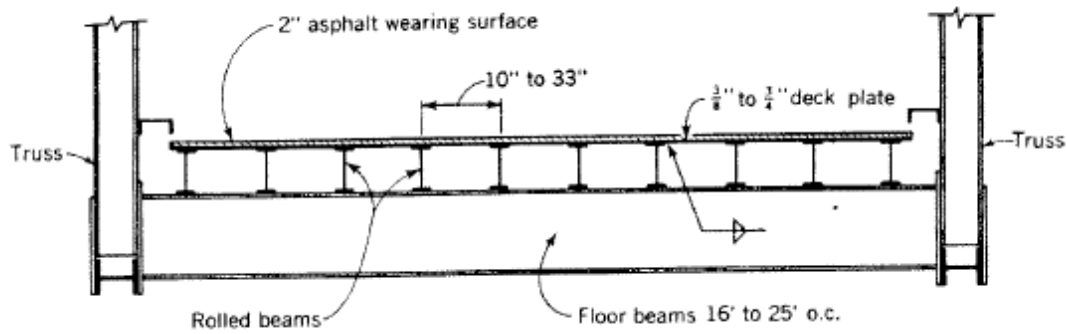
Typical "battle deck floor" bridge cross section (Wolchuck, 1963)
